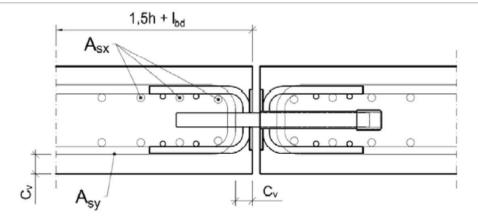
Arrangement of reinforcement at minimum slab thickness
